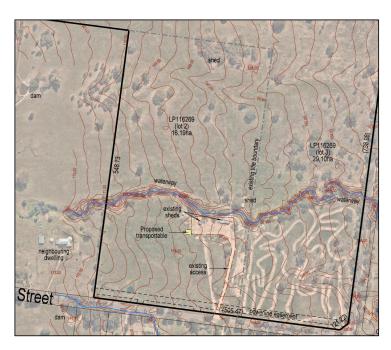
Site plan showing the proposed transportable, and existing sheds
